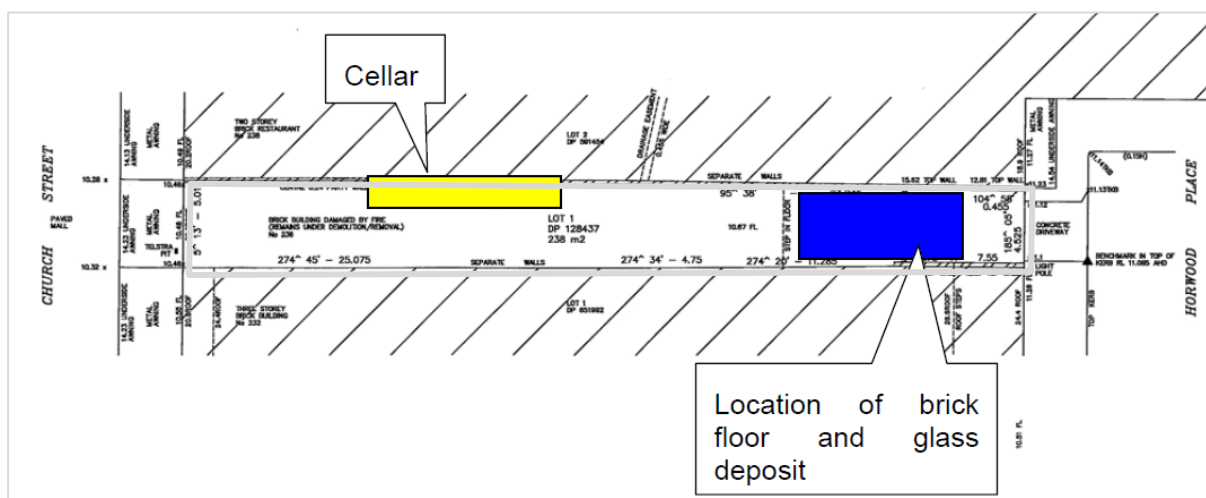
Plan of 236 Church Street showing the location of the cellar and brick floor, both retained within the site. (Source: Austral 2006⁵)
